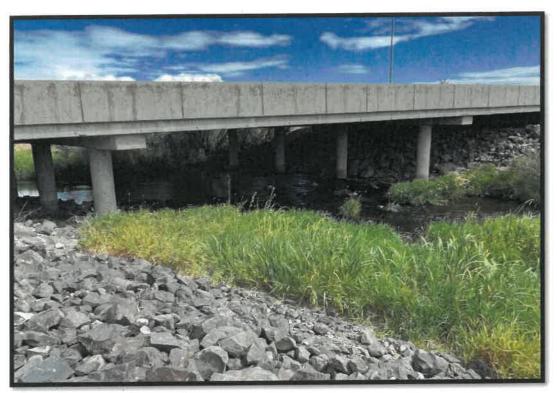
View of WB Wilson Creek Bridge facing northeast.
